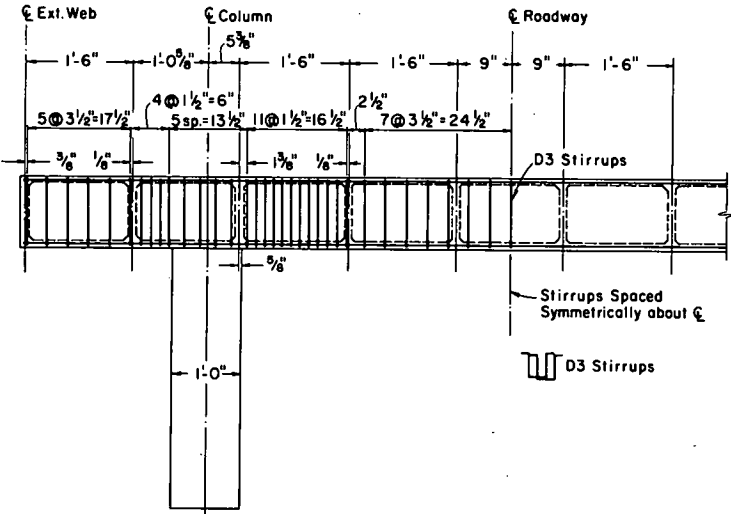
Bent Cap Reinforcement for Specimen DC-9
